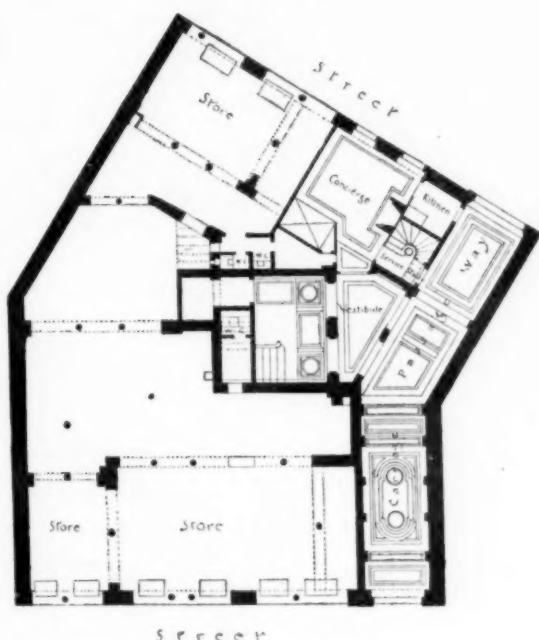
Apartment-house in Paris with Carriage Passageway. MM. Lemonnier & Vergnon, Architects. Street Plan: After *La Construction Moderne*.
